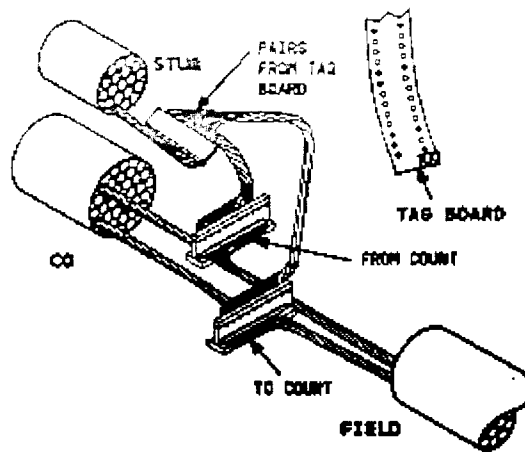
Placing Pairs From Tag Board Half-Tap Module on Stub Cable
